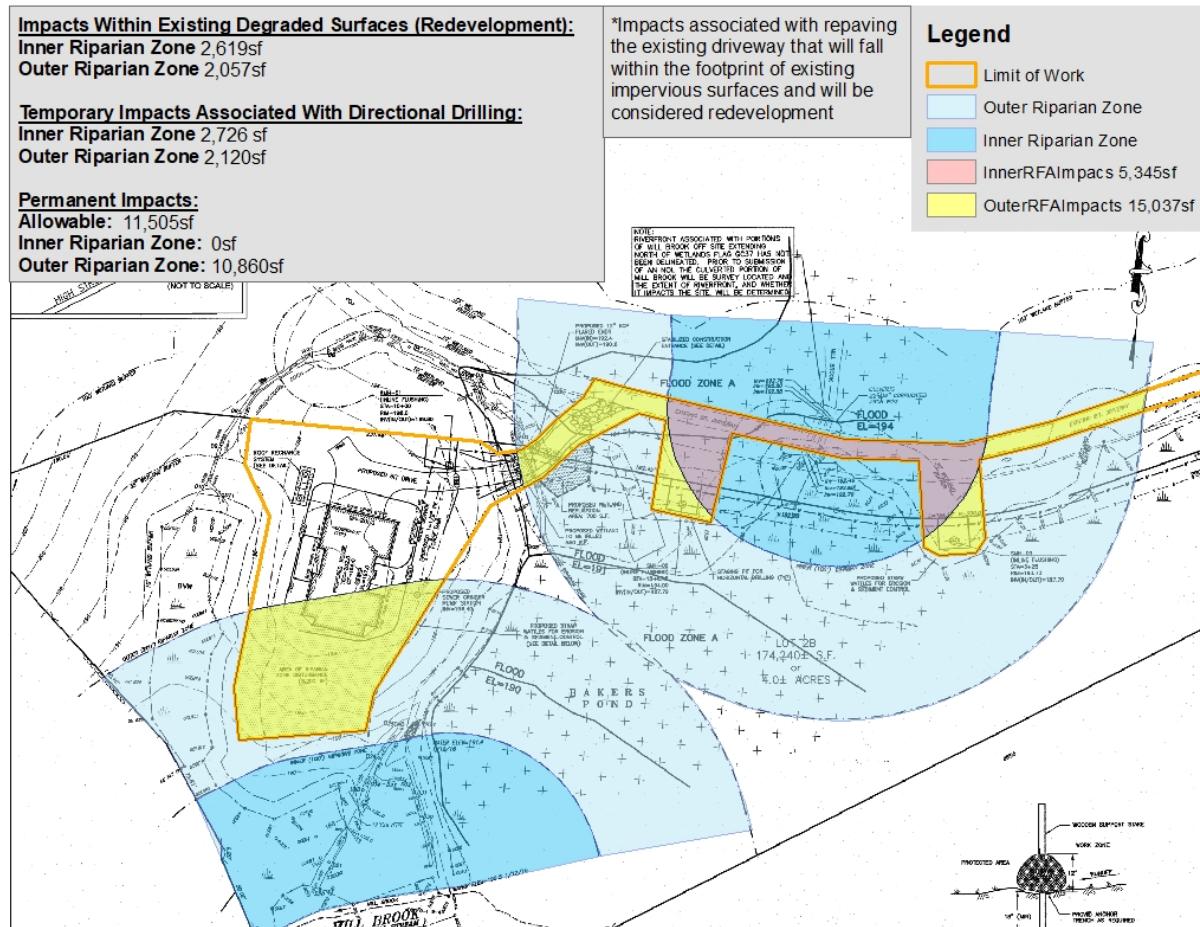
Impacts to the Inner and Outer Riparian Zones as a result of the proposed construction.
